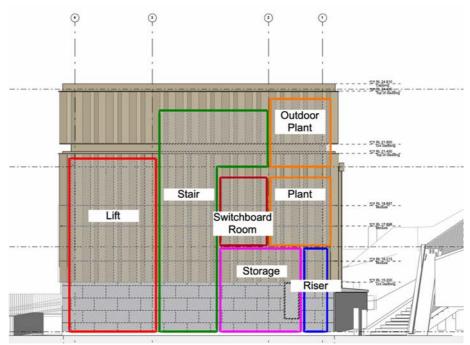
BAL East elevation marked up with what is behind the areas of facade.
